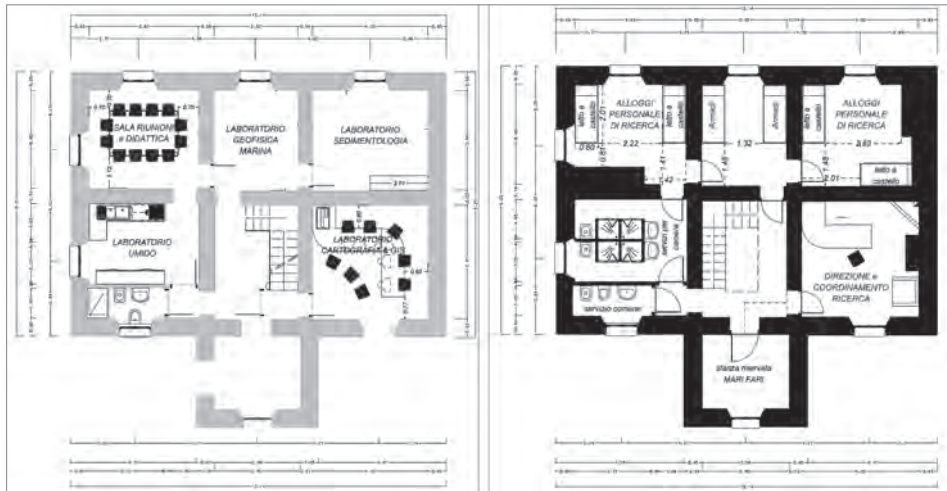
Plan of the Lighthouse, ground floor and first floor.
